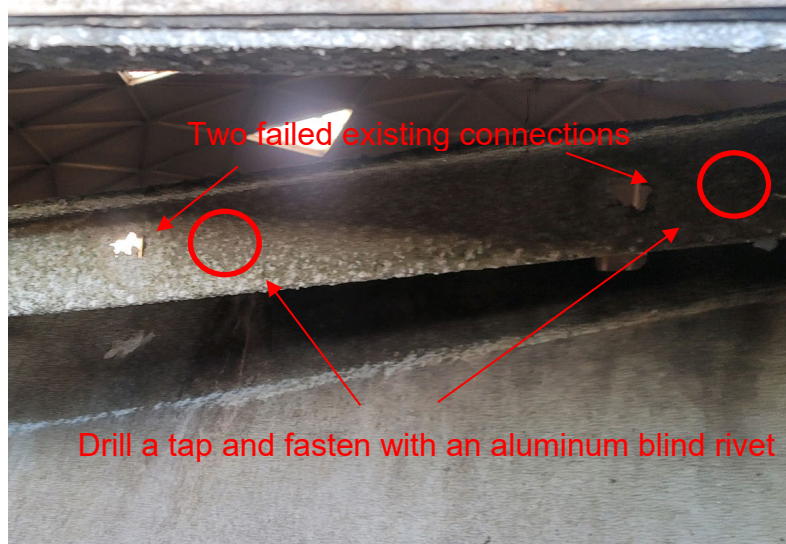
Aluminum angle and connections to the baffle wall (Typical)
